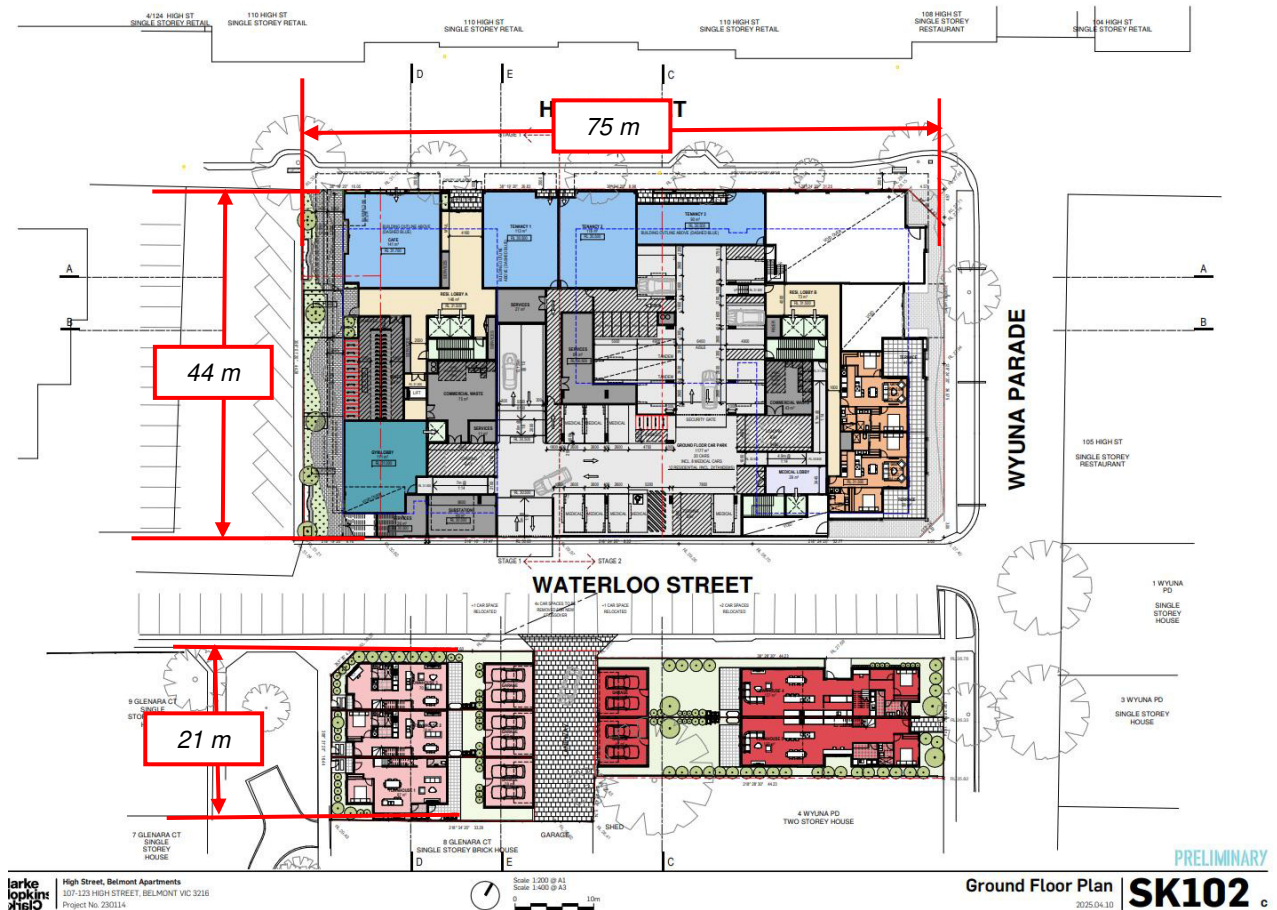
Ground floor plans with the plan-form dimensions overlaid.
